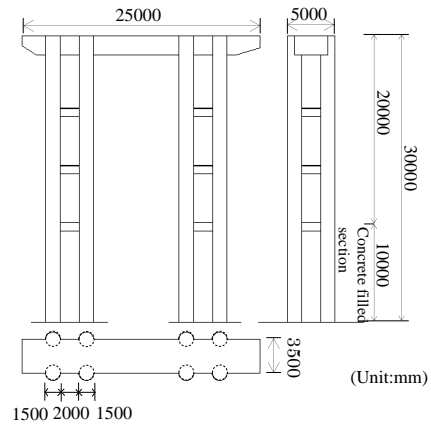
General diagram of steel pipe integrated Rahmen pier
